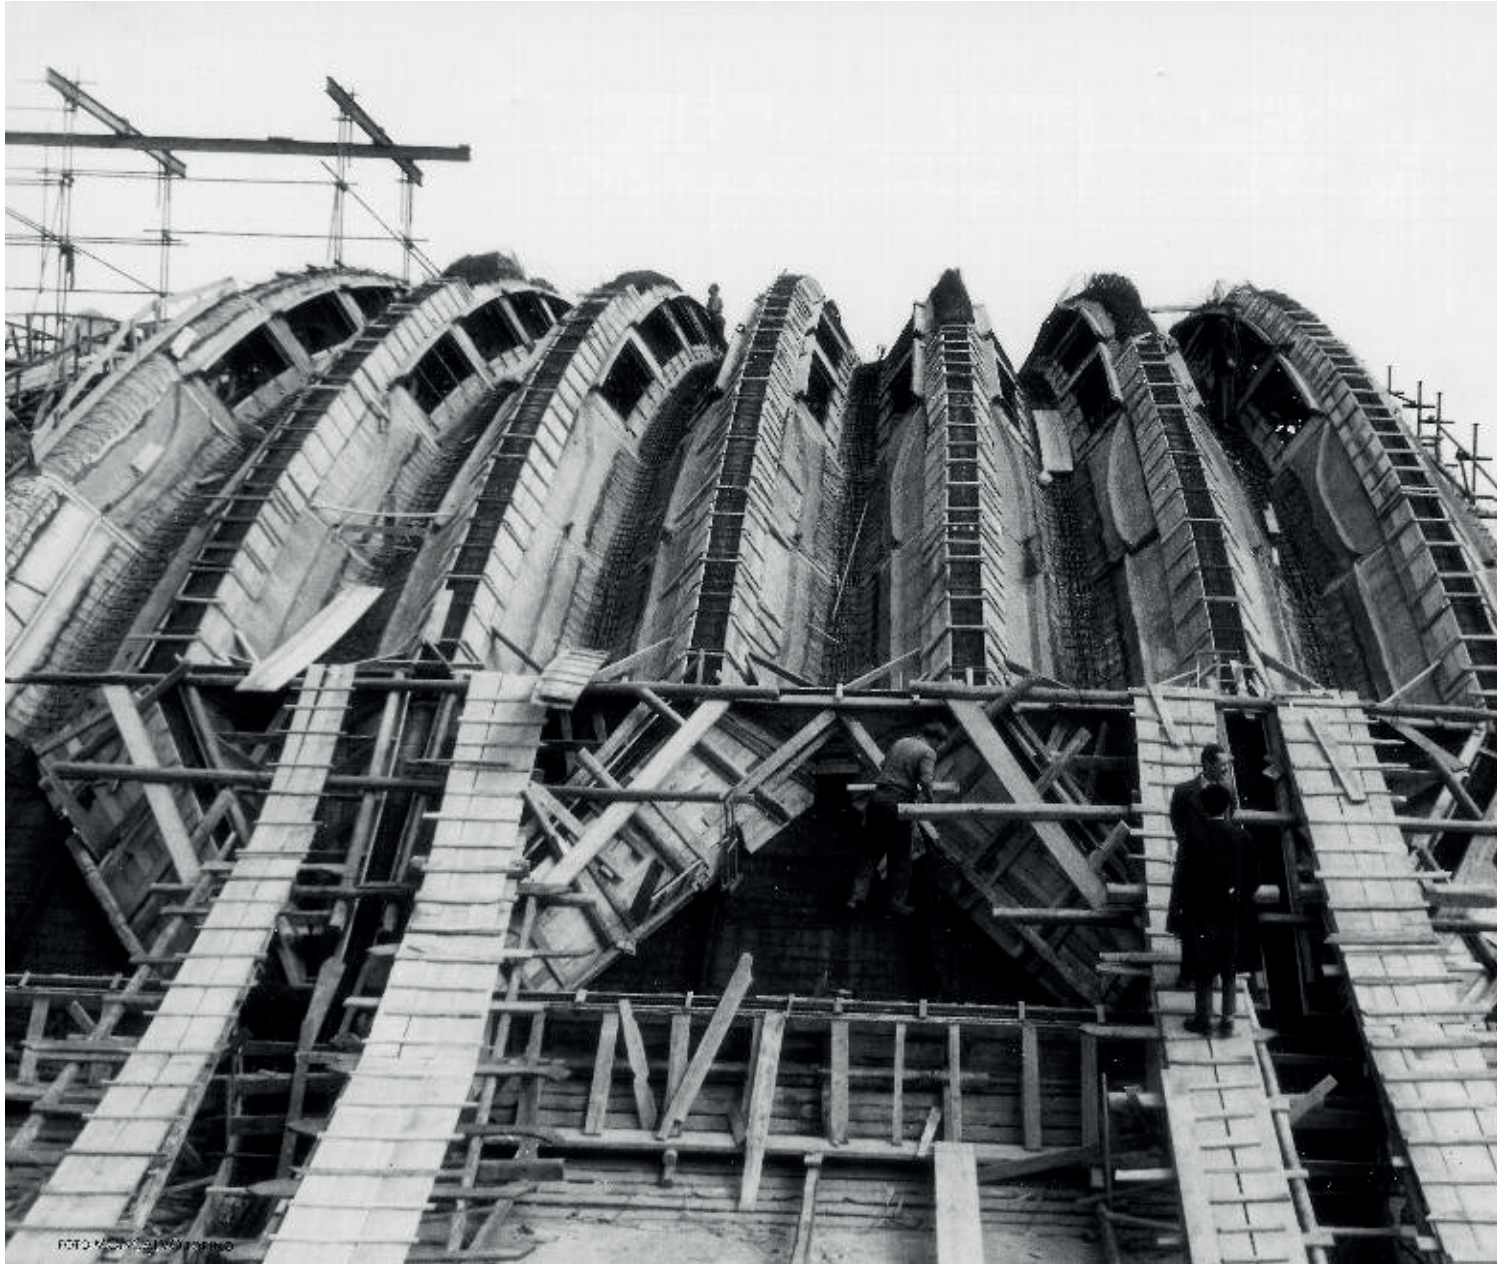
Construction of Turin Exhibition hall by Pier Luigi Nervi, 1948.
